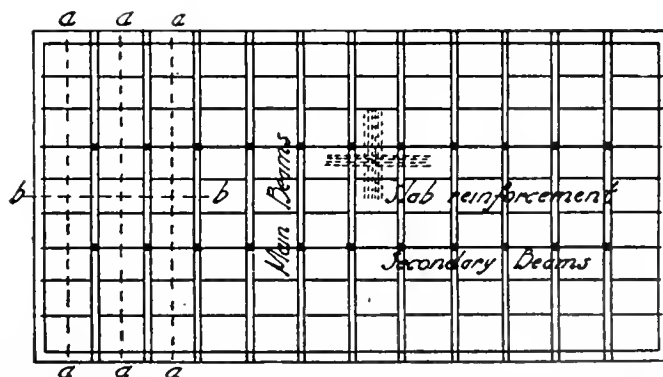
Main Beams With Column Supports; Secondary Beams—Planes on Centre Lines of Slabs, Parallel to Main Beams; also at Centre of Middle Span.
